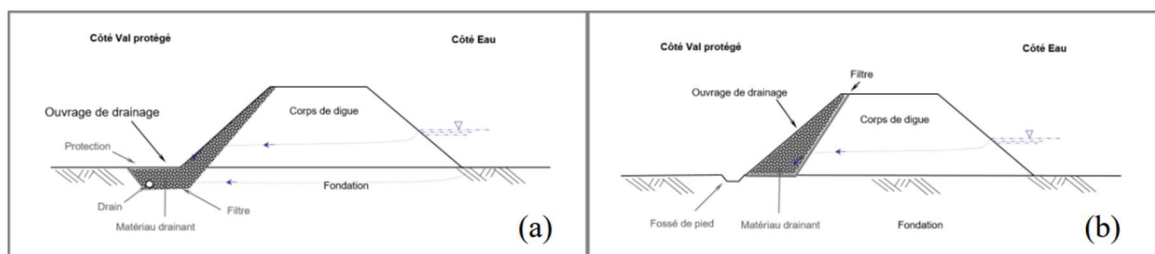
Schematic diagram of a drainage layer without additional fill on the protected side (on the left of the image), (a) with anchoring and (b) without anchoring (Source: Université Gustave Eiffel).
